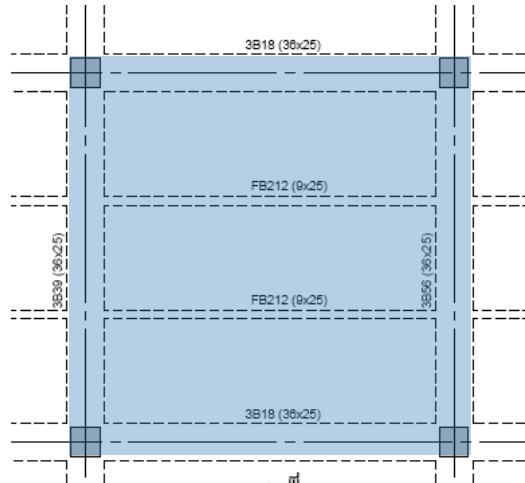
| Typical Bay from Third Floor Area D Floor Plan (Walter P. Moore)
